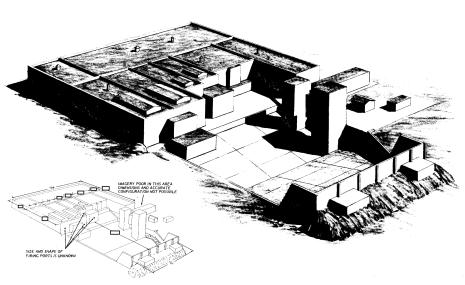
LAYOUT OF ARMAMENTS PLANT 66.
